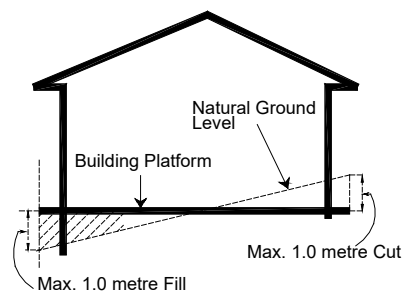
Cross section of cut and fill on a residential site.
